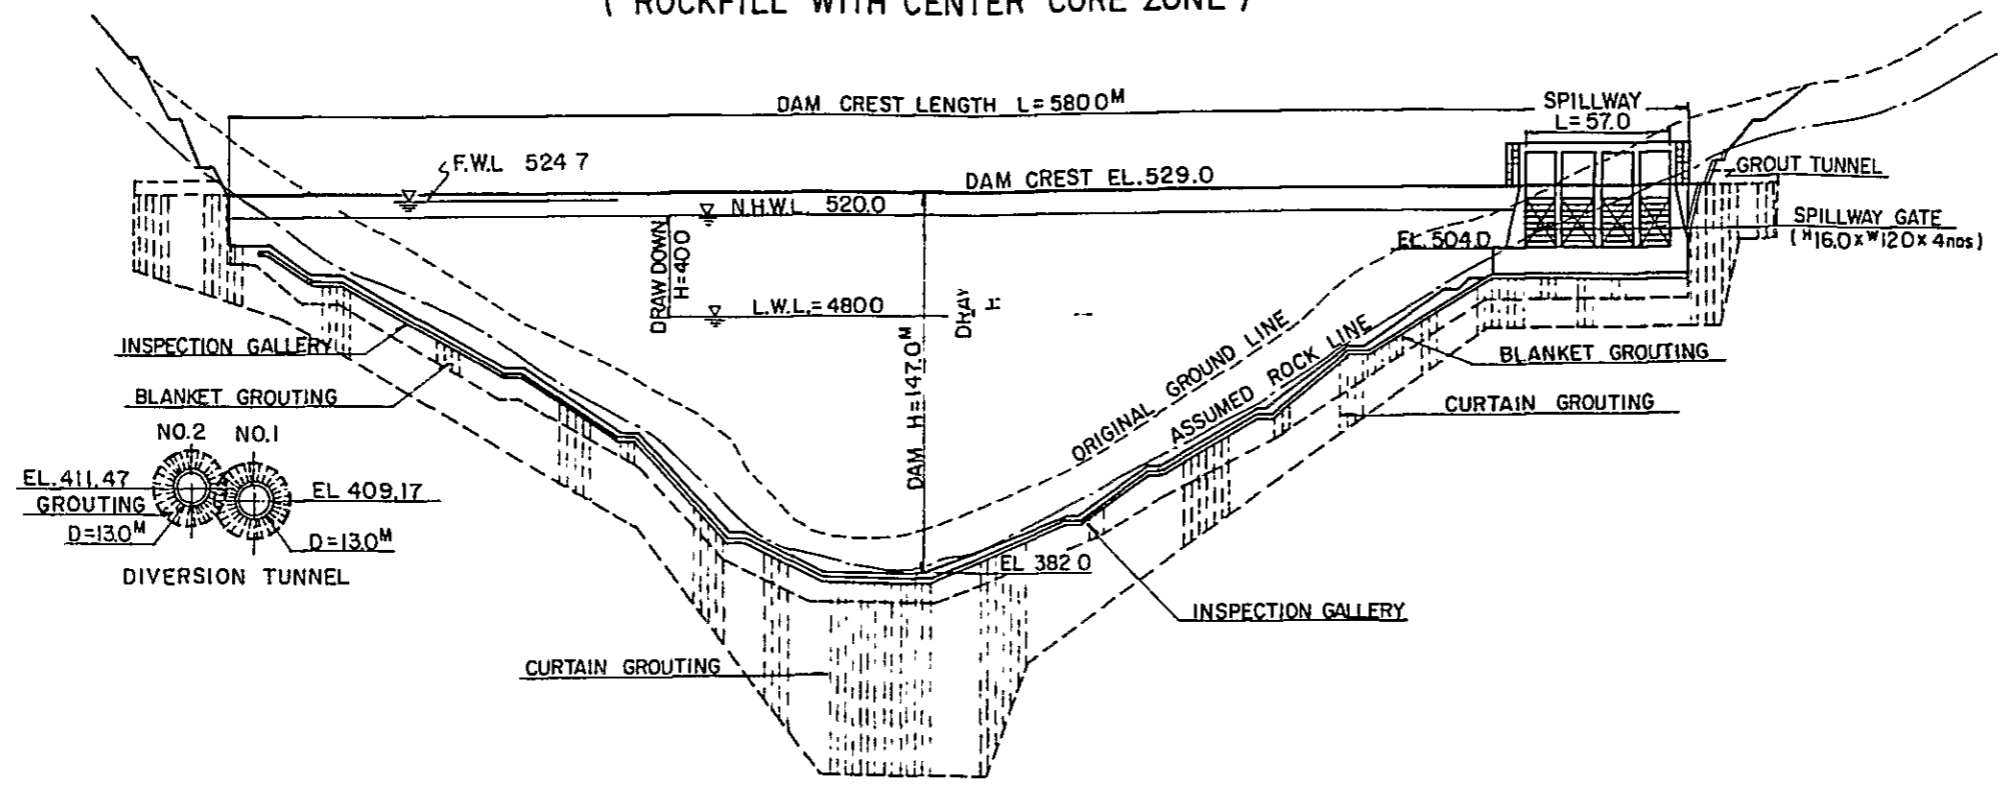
TYPICAL CROSS SECTION AND PROFILE
